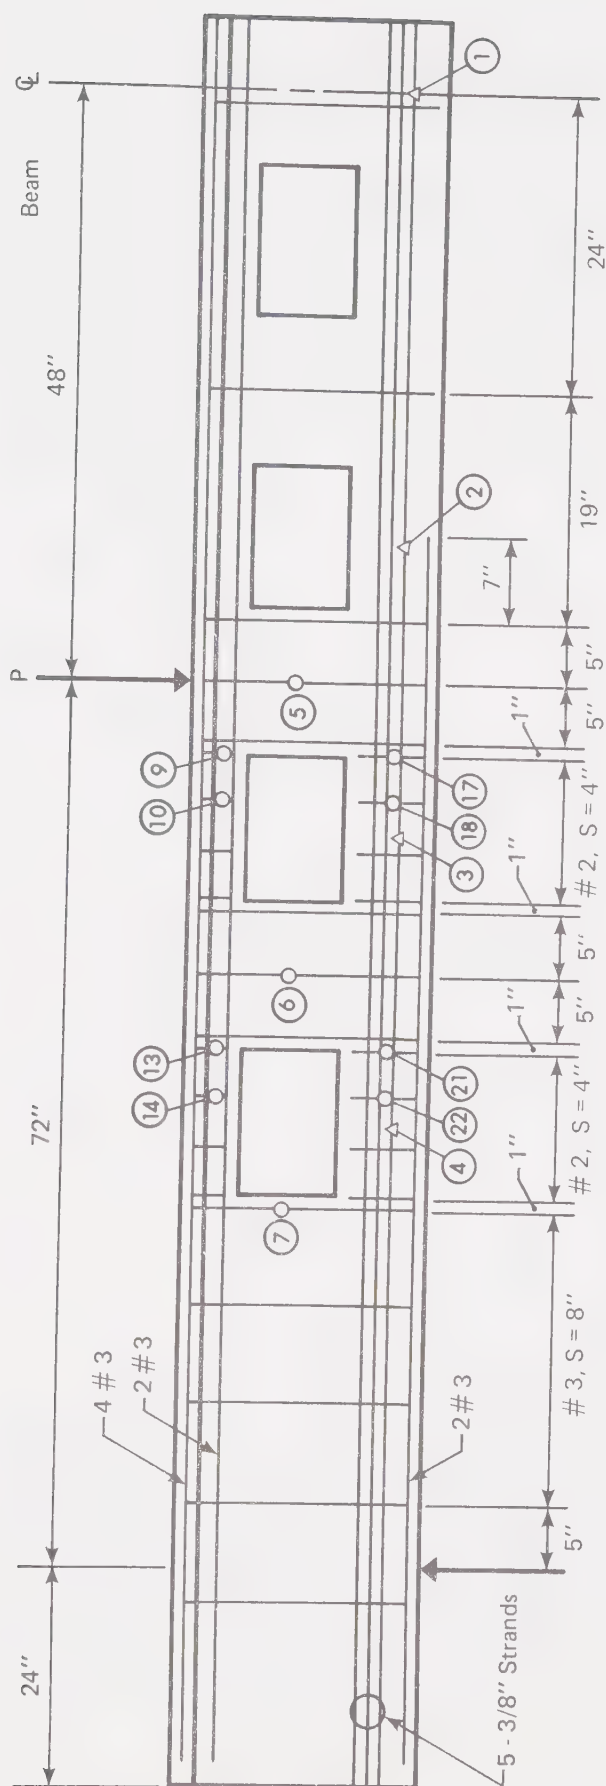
Reinforcement Details and Strain Gage Locations for Beam 16-12-6
